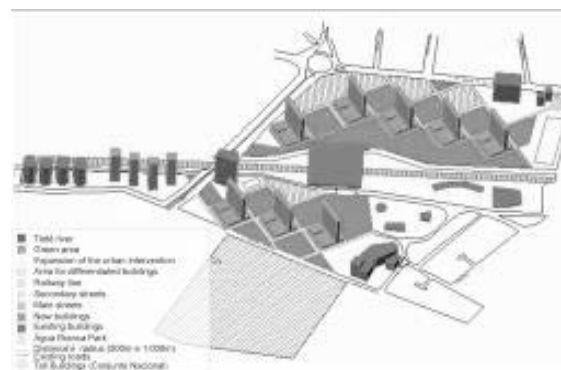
Barra Funda site: the slab building with the podium in the open site with the few existing buildings.
